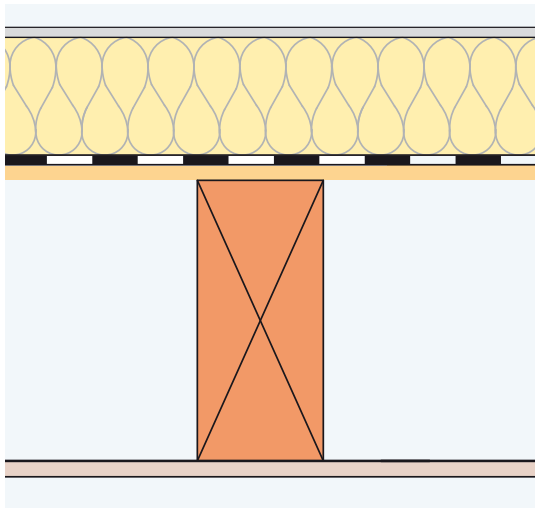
19mm timber deck with 12.5mm plasterboard and skim fixed to timber joists
